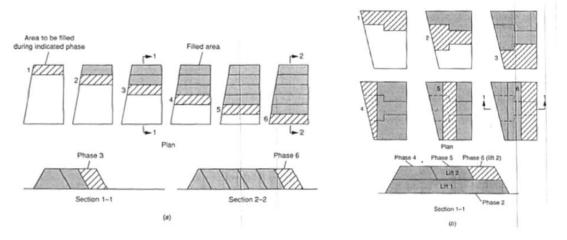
Typical example of solid waste filling plans: (a) filling plan for single-lift and (b) filling plan for a multi lift landfill
